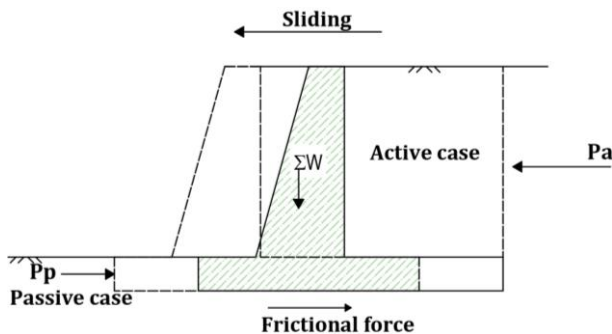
Sliding behavior in retaining wall (Uray 2020).
